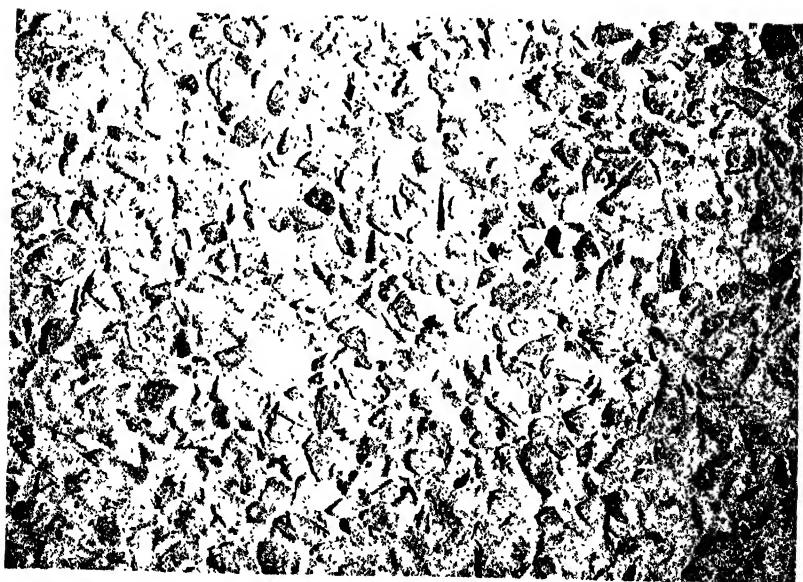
Surface of Washed Concrete. (See p. 289.)
